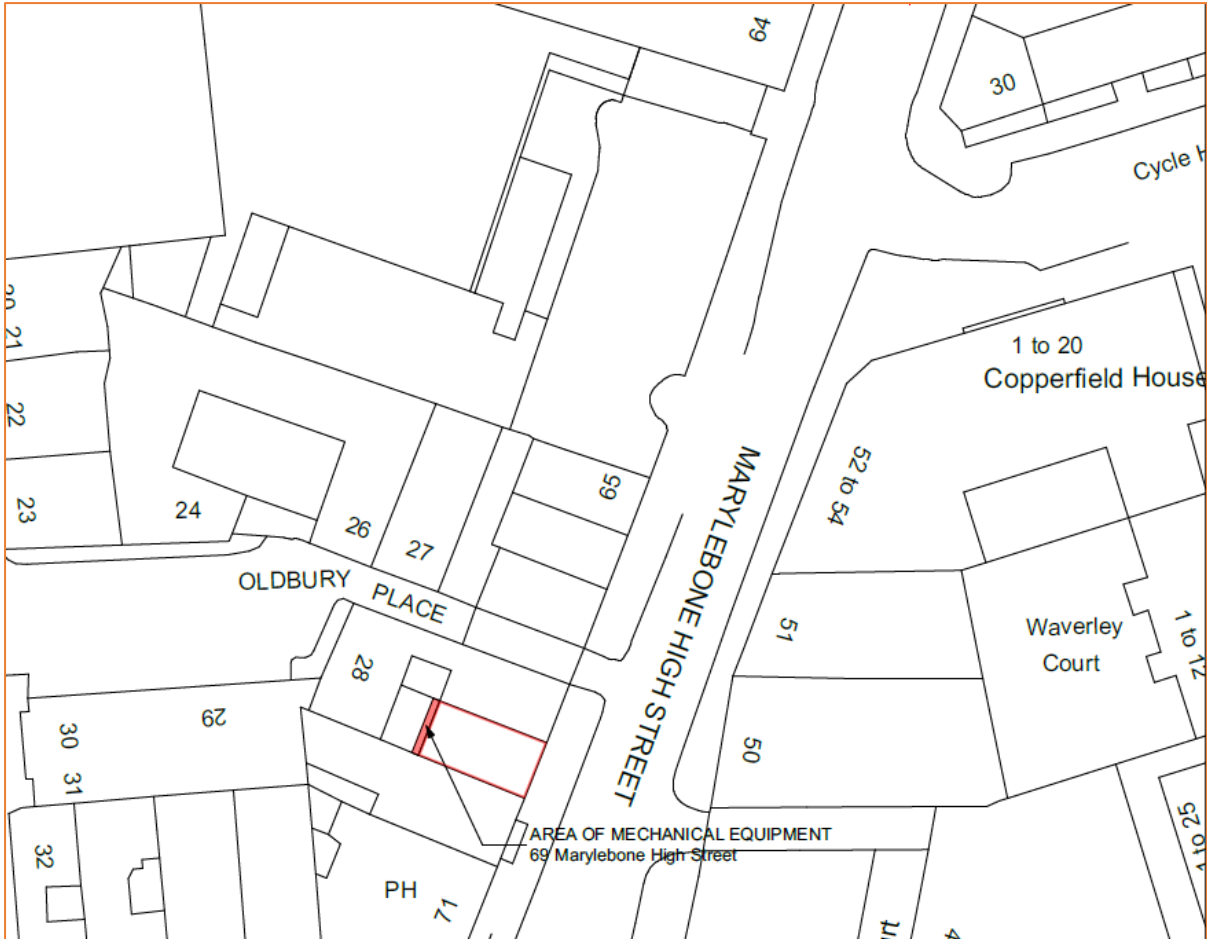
Site Location Plan (Source: Gregori Chiarotti Projects)
